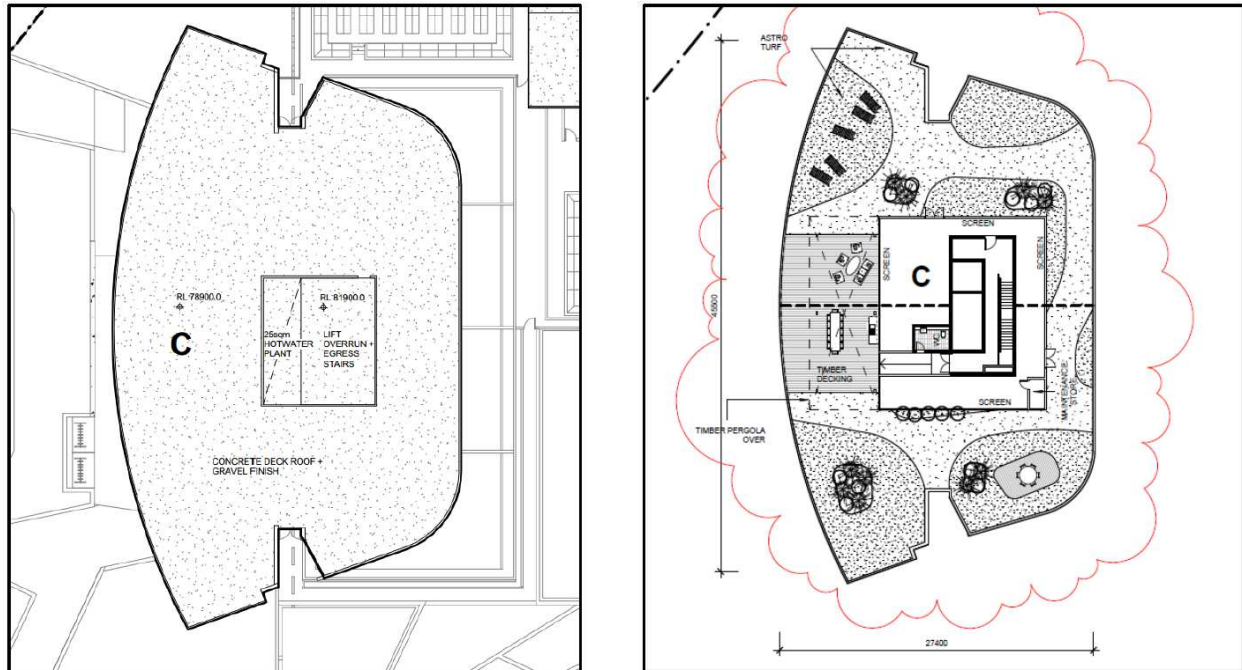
Approved (left) and proposed (right) amendment to the rooftop layout (Source: Proponent's application)
